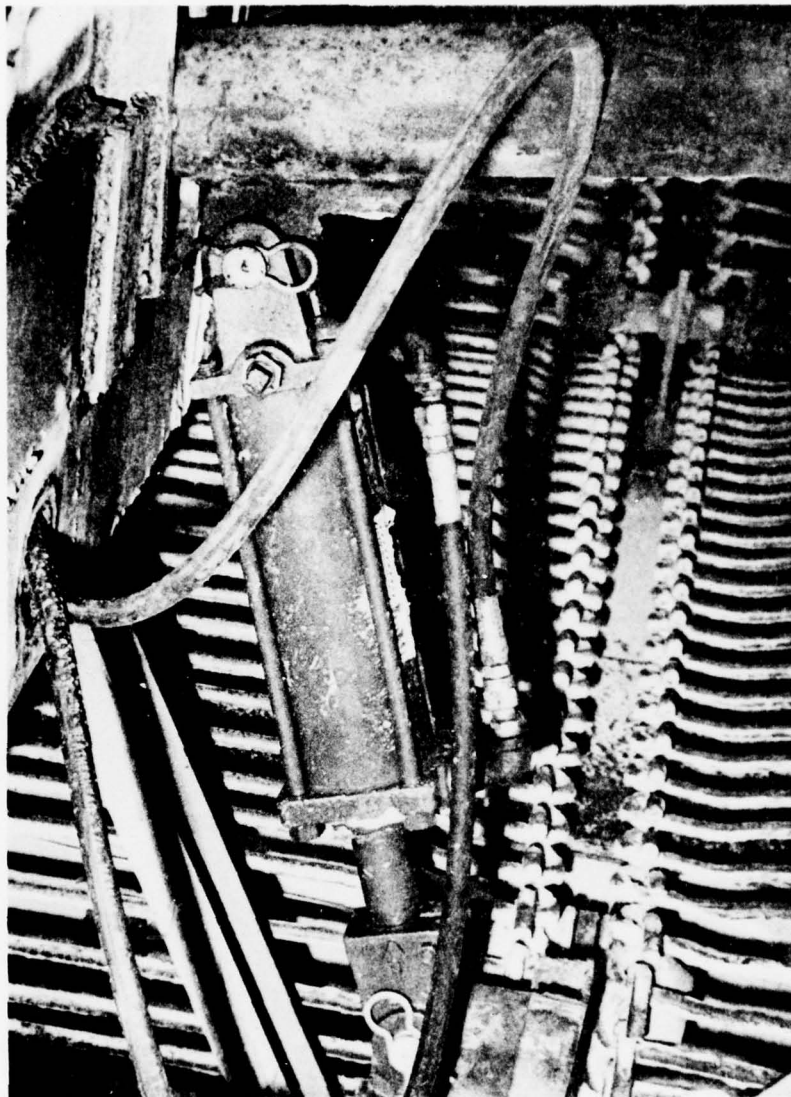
Axle tilting mechanism mounted on SSCV axle; self-level cylinder is fastened to the right side of the axle.
